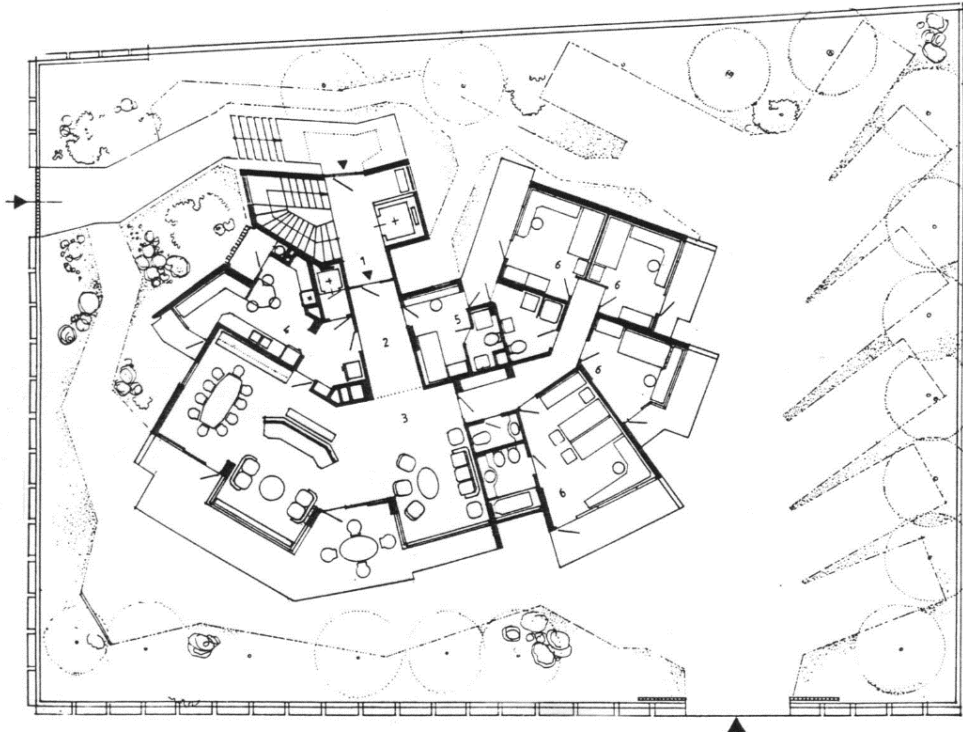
Floor plan of a housing unit in Kaplancalı Apartment, 1974
